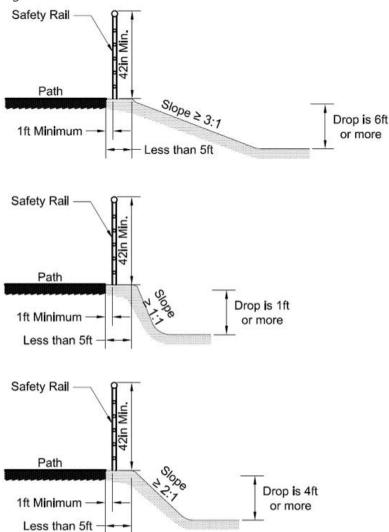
Conditions Where Barriers to Embankment are Recommended
